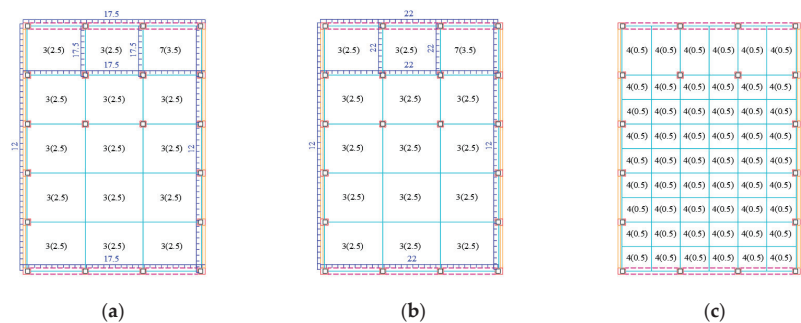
Load plan layout of frame KJ2. (a) First to second storey; (b) Third storey; (c) Fourth storey.
